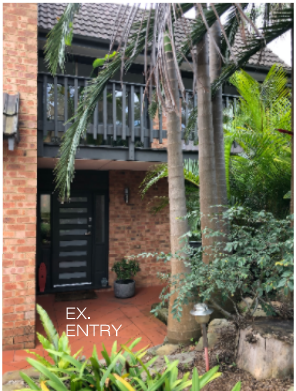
PHOTO B EXISTING BALCONY 02 TO BE ENCLOSED
